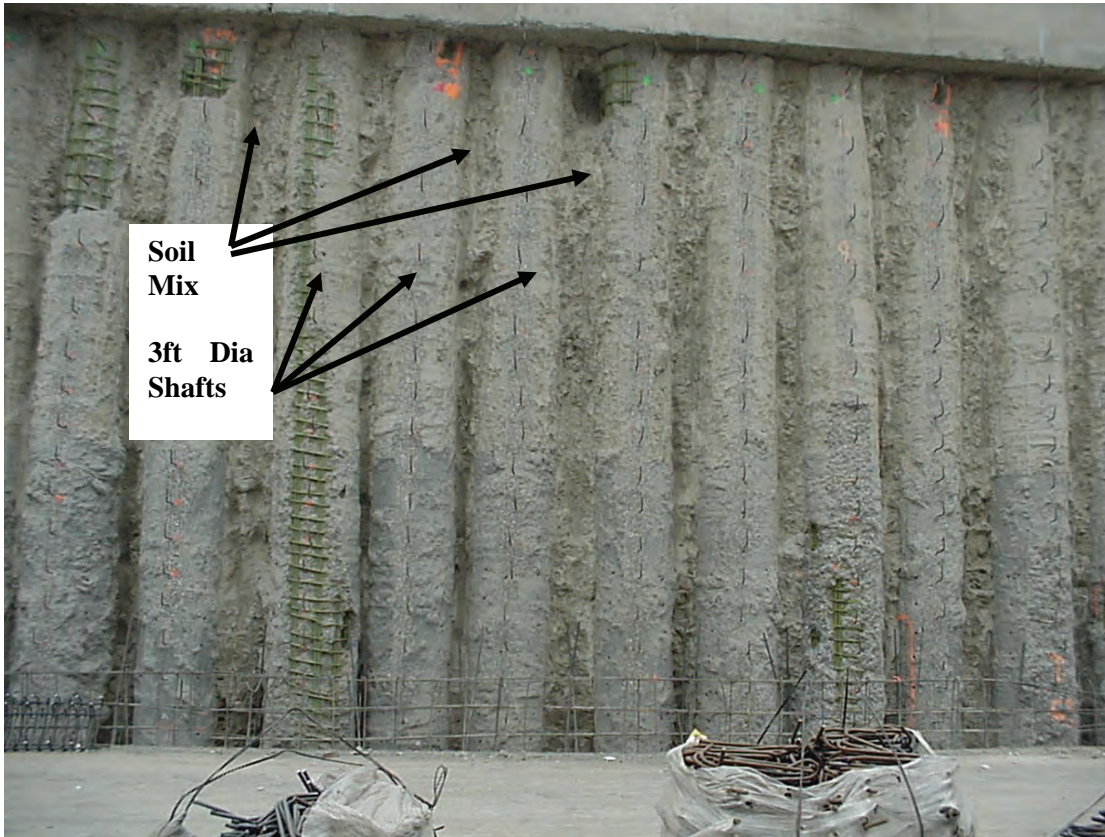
Use of Soil Mixed Columns in Conjunction with Drilled Shafts for a Wall
